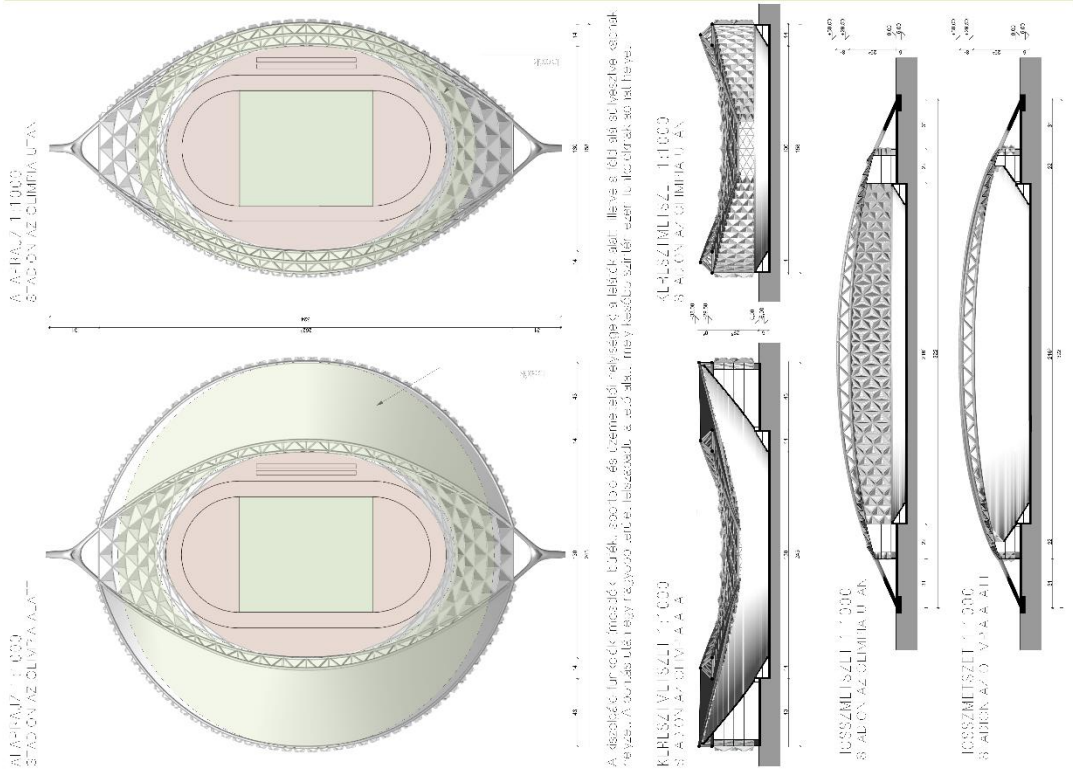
II. FLOOR PLANS, SECTIONS, PERSPECTIVE VIEWS
